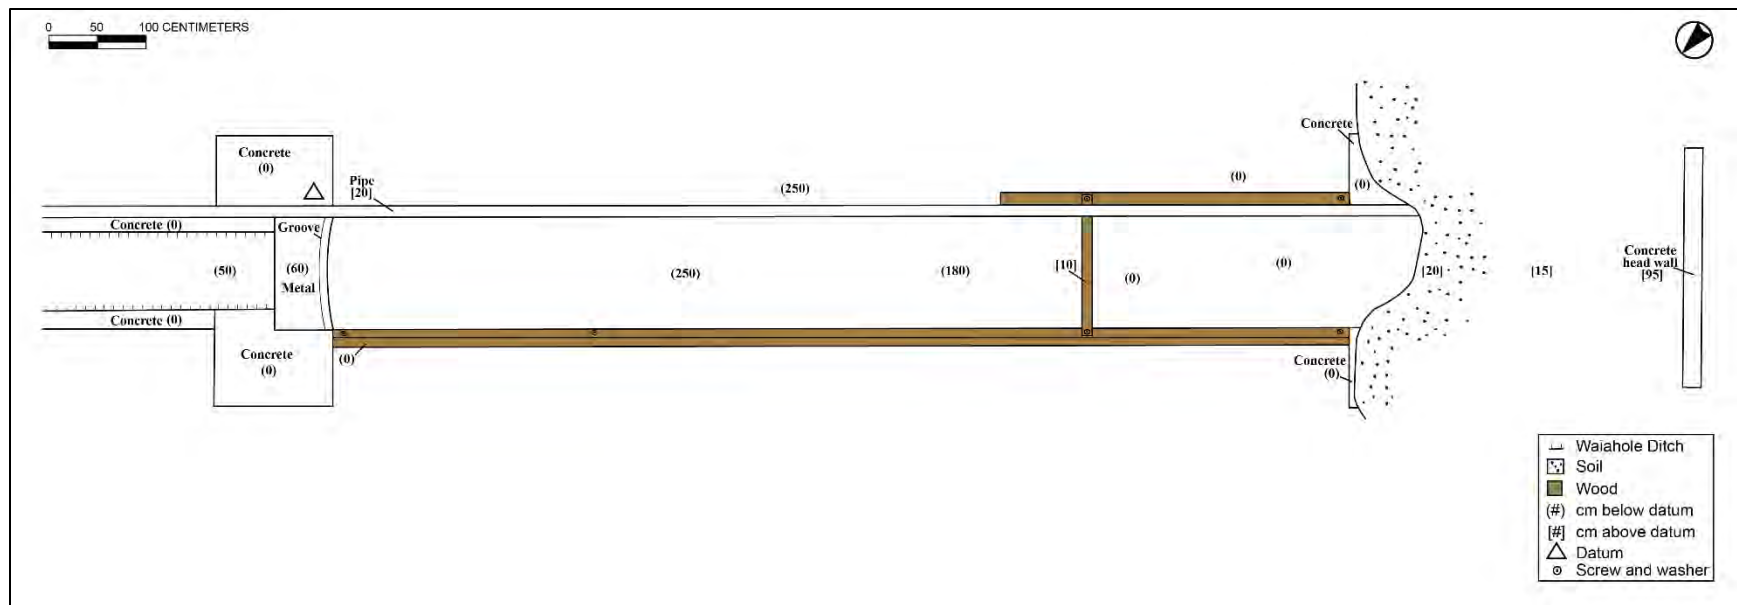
Plan map of SIHP # 50-80-08-2268 Feature I, showing portion of the Waiahole Ditch, collapsed bridge components, and head wall
